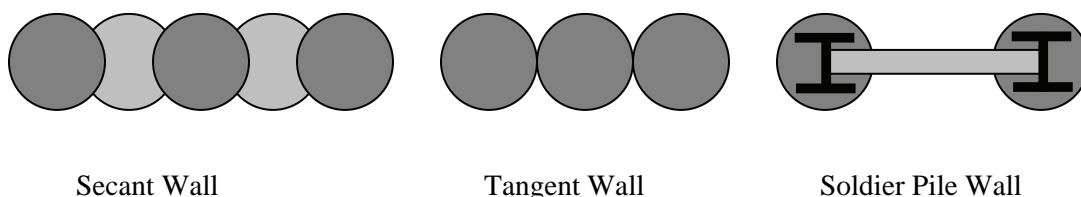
Secant, Tangent, and Soldier Pile Walls
